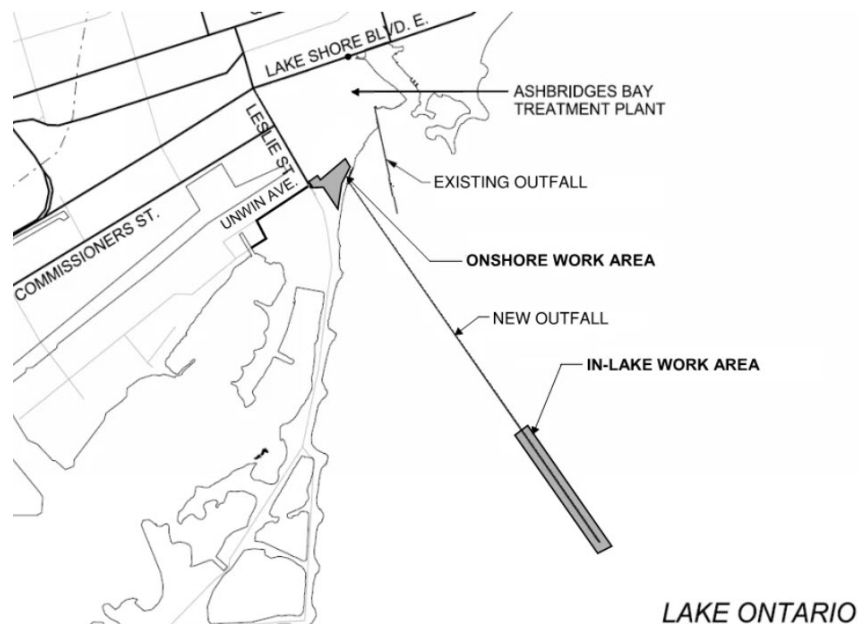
Ashbridges Bay Outfall map of works. (Image: <http://tunnelingworld.com/project-show-case/ashbridges-bay-wastewater-outfall-tunnel/>)
